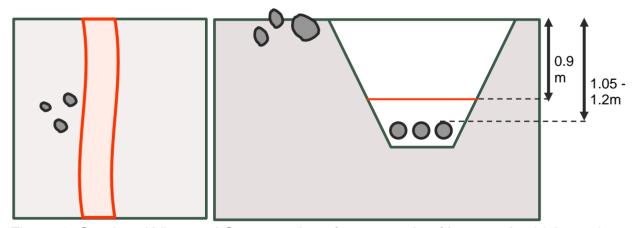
Overhead View and Cross section of an example of large rock which can be broken or removed (post removal).
